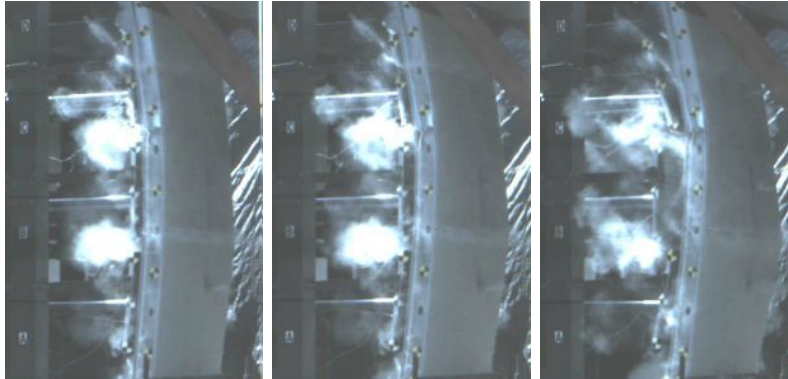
Full-scale wall tests progression of damage from high-speed cameras.
